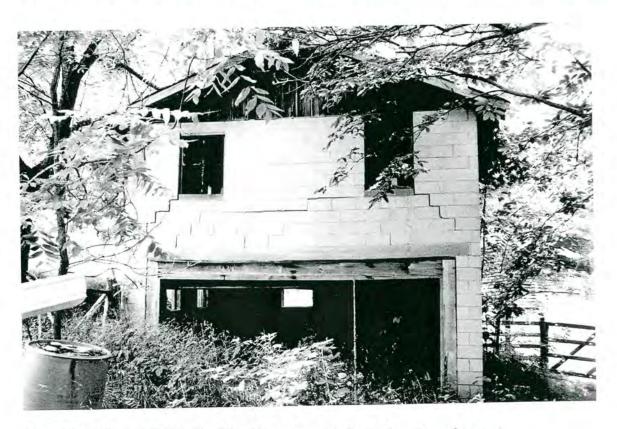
E.W. and Dollie Huskins House - north front elevation of garage
